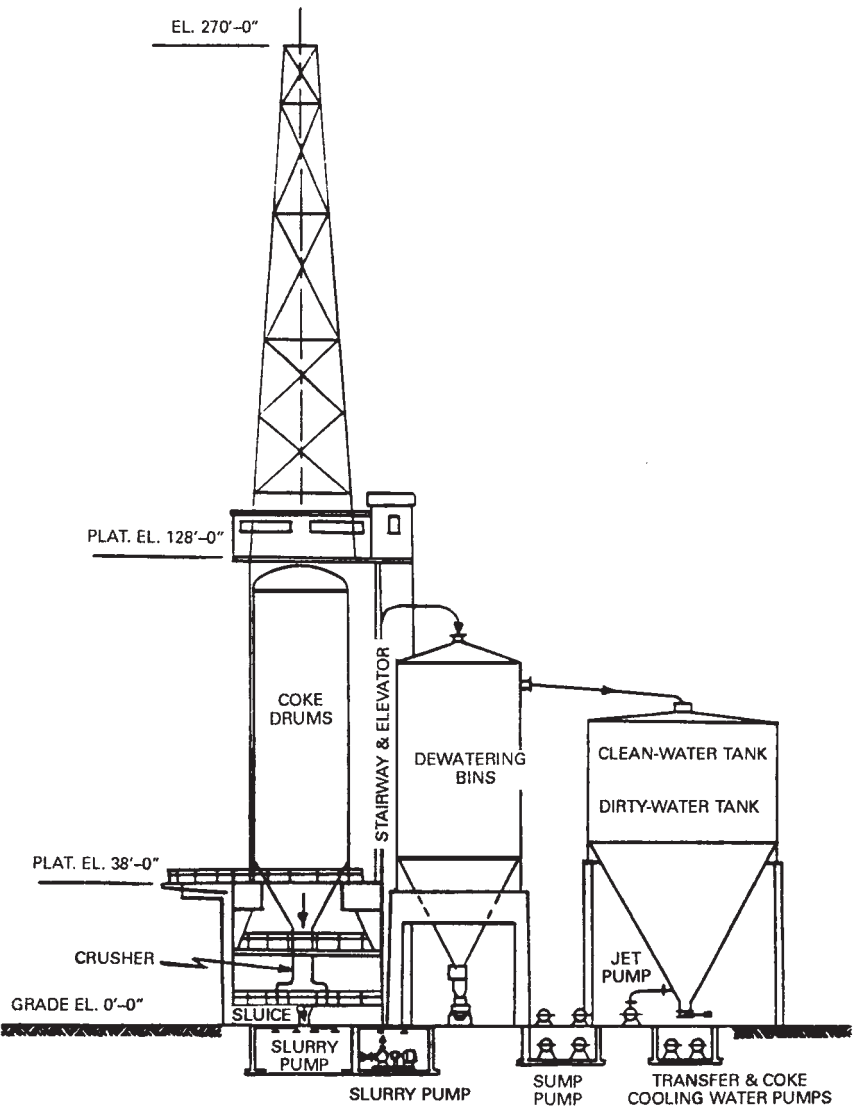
Elevation view of a totally enclosed slurry dewatering system.
